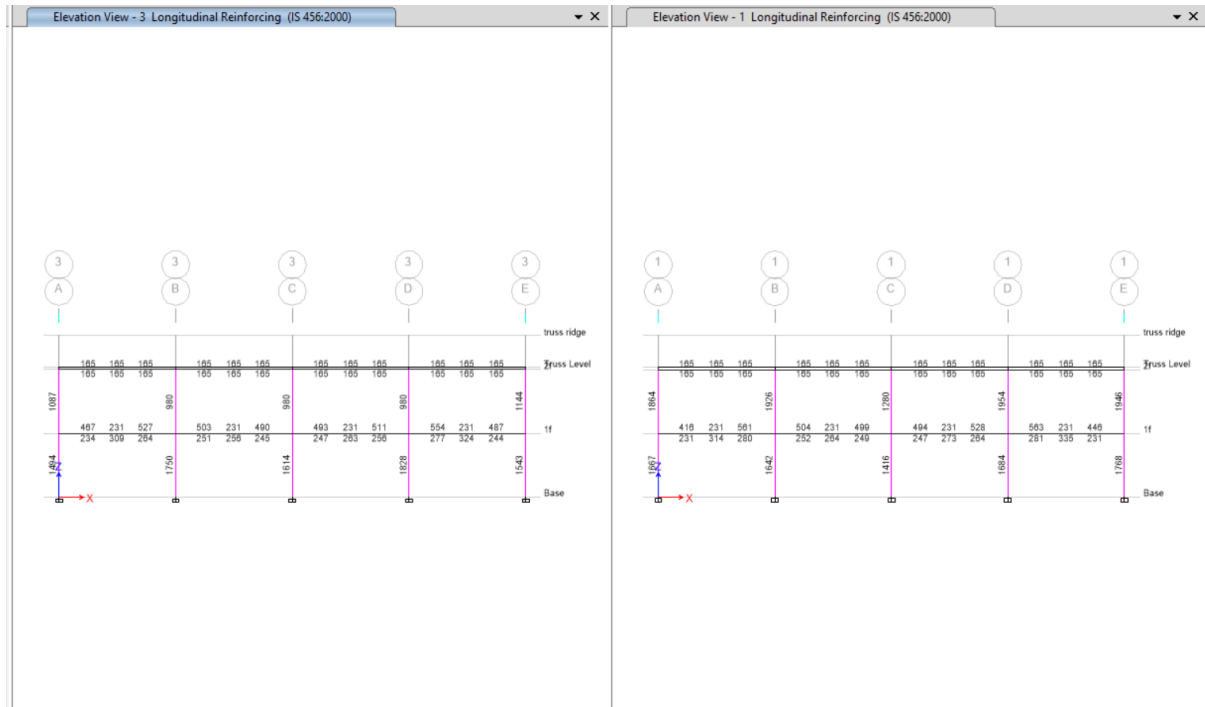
Typical longitudinal reinforcement of column in Grid 1 & 2
